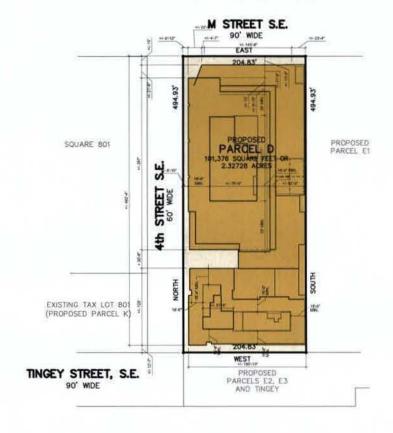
EXHIBIT SHOWING PARCEL D SOUTH EAST FEDERAL CENTER #6192 WASHINGTON, D.C.
